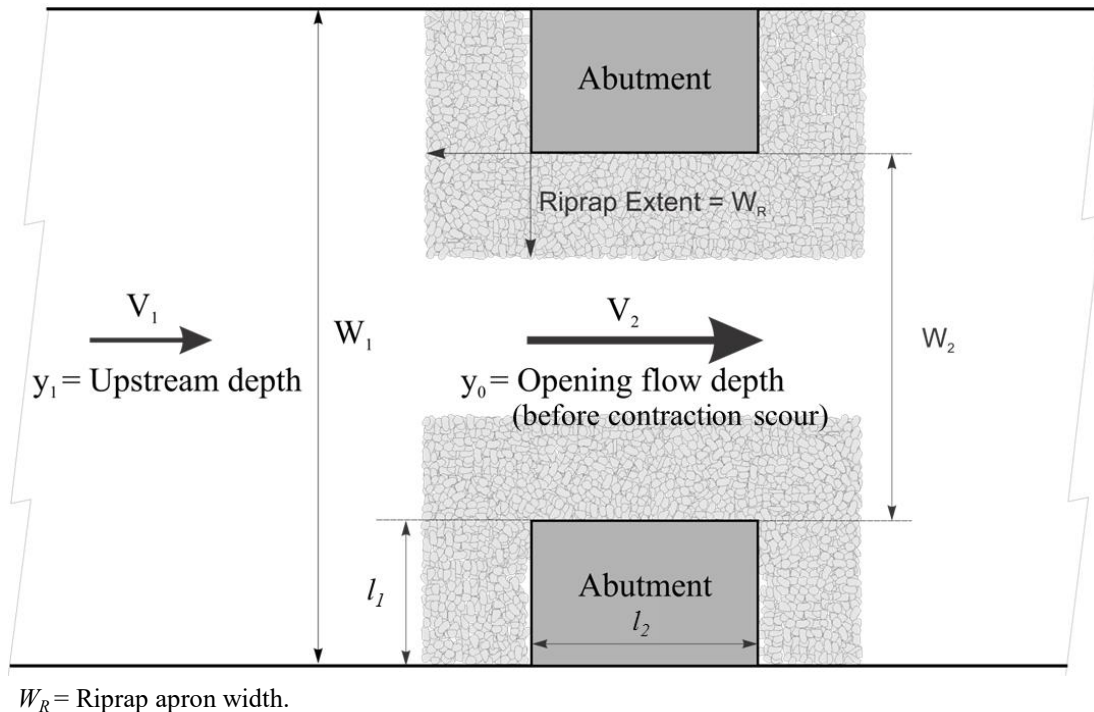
Sketch. Plan view of a bridge contraction with riprap apron.
